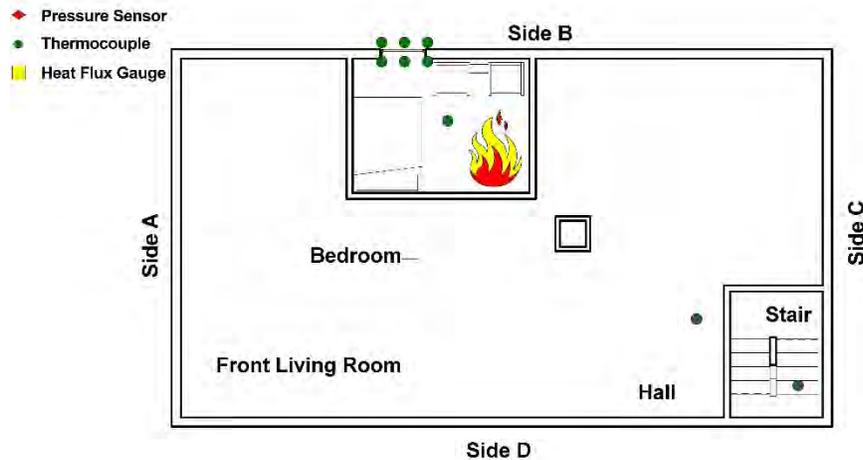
7: Burleigh St. Second Floor Instrumentation
